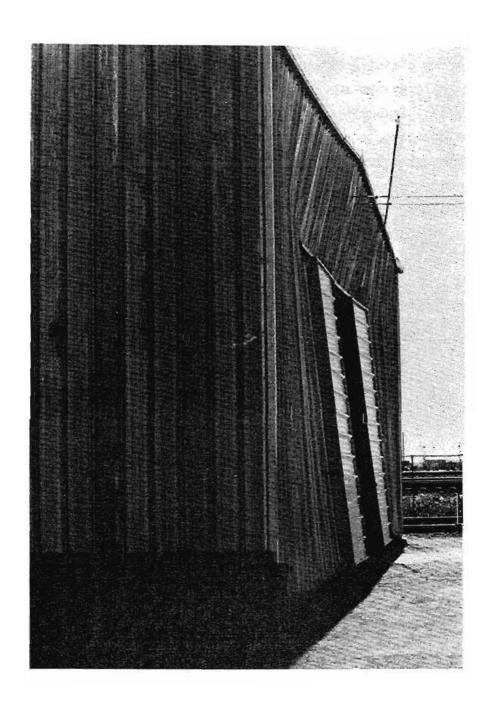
METAL BUILDING SYSTEMS MAY SUSTAIN FAILURE BECAUSE OF A WEAK COMPONENT. Overhead doors or the bracing in windward walls sometimes are the failure initiation points.
